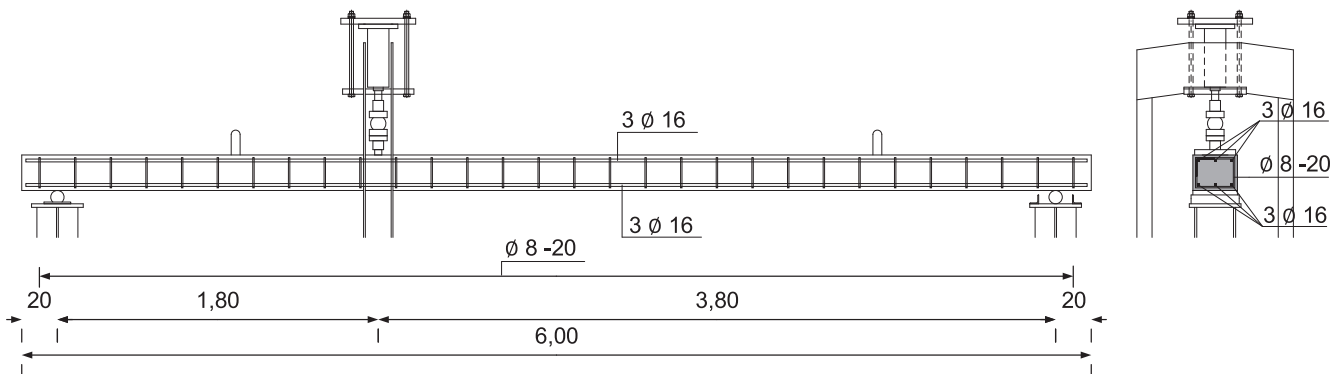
Side view (left side) and cross sectional view of the loading situation and the laboratory beam (with reinforcement).
